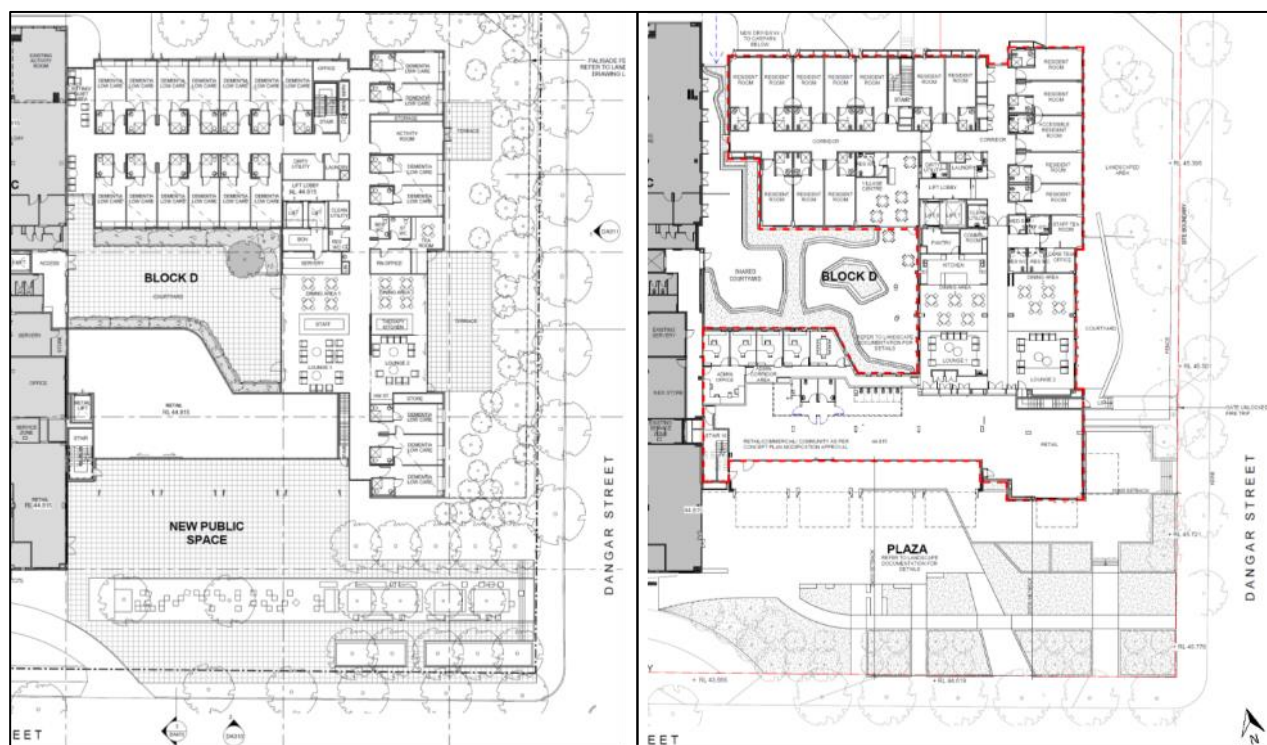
Approved (left) and modified (right) ground floor layout (Source: Proponent's application)
